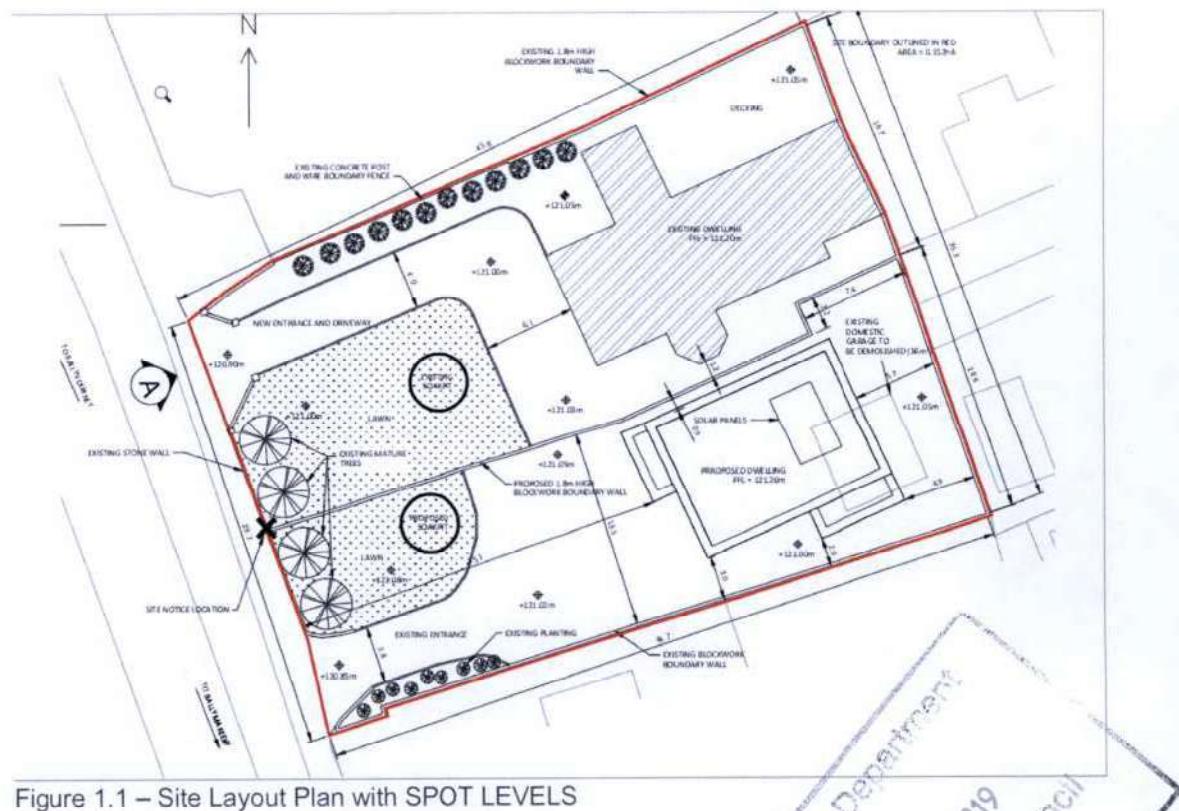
Site Layout Plan with SPOT LEVELS
